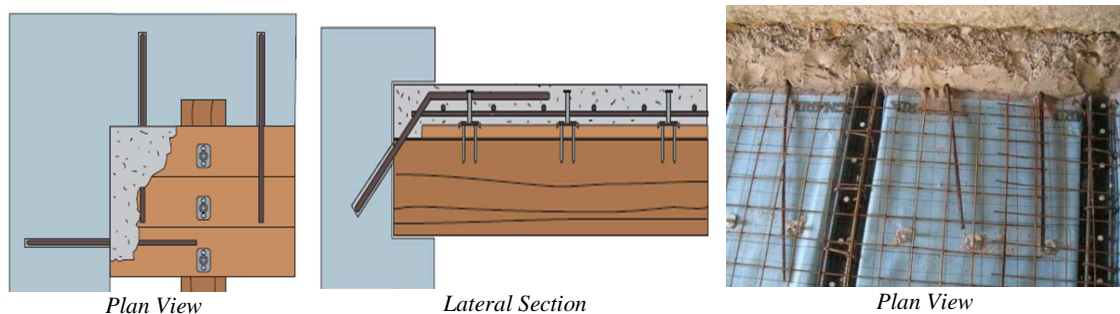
Connection Dowels Embedded into the Concrete Topping Overlay Tecnaria [34].
